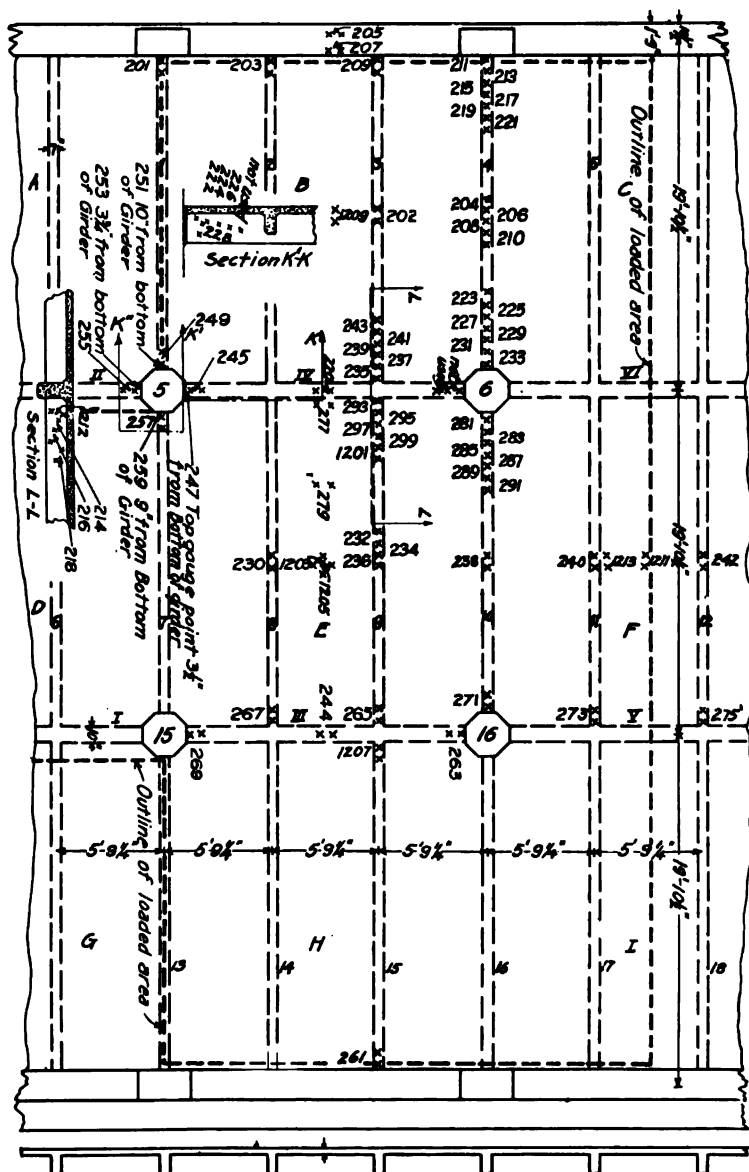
PLAN SHOWING LOCATION OF GAUGE LINES ON UNDER SIDE OF FLOOR.
